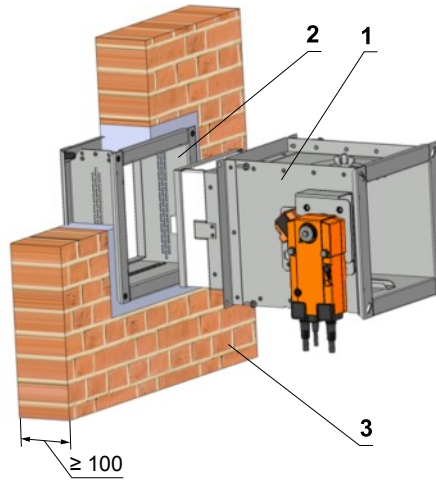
Solid wall construction - installation frame E1, E2, E4
